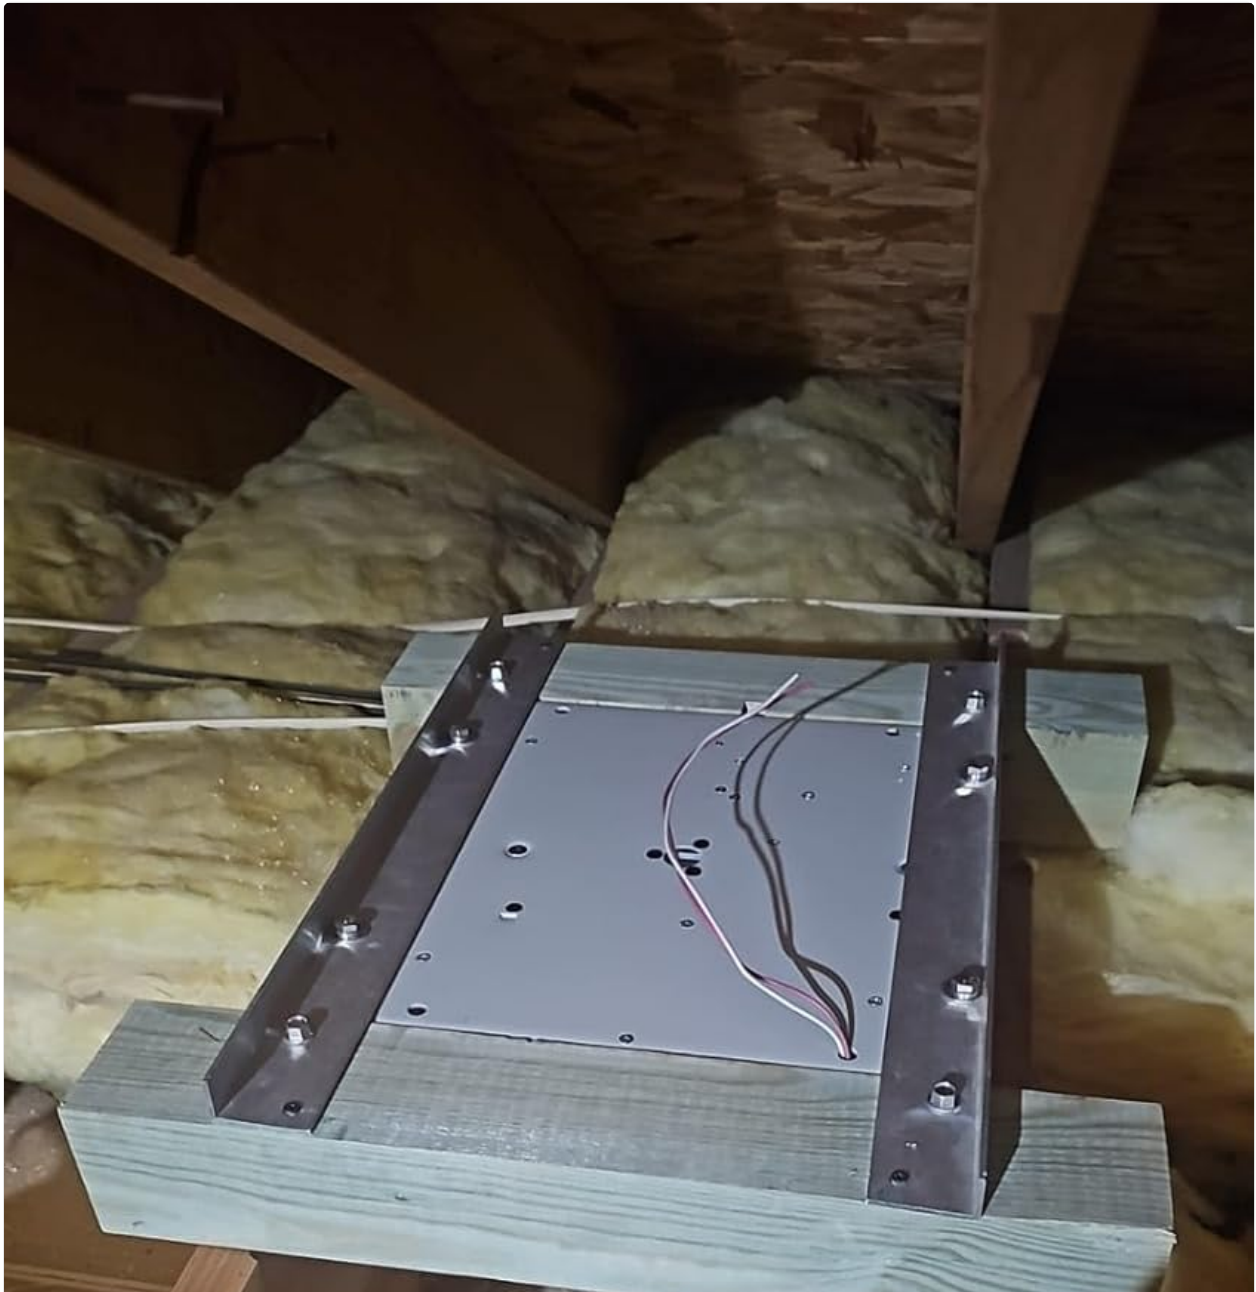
Chandelier lift system mounted within attic joists, demonstrating the use of wooden blocks and metal brackets for secure installation.
